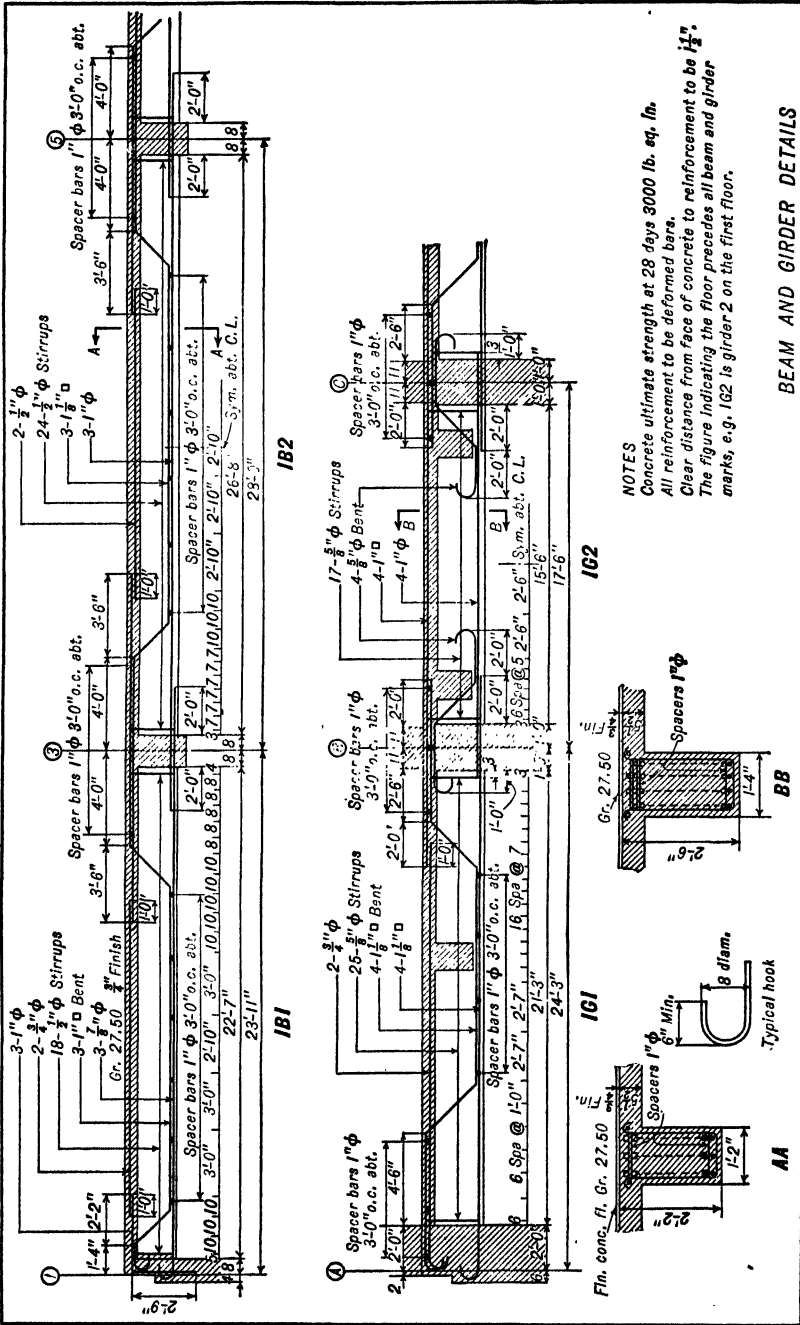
Beam and Girder Details — Reinforced Concrete.
